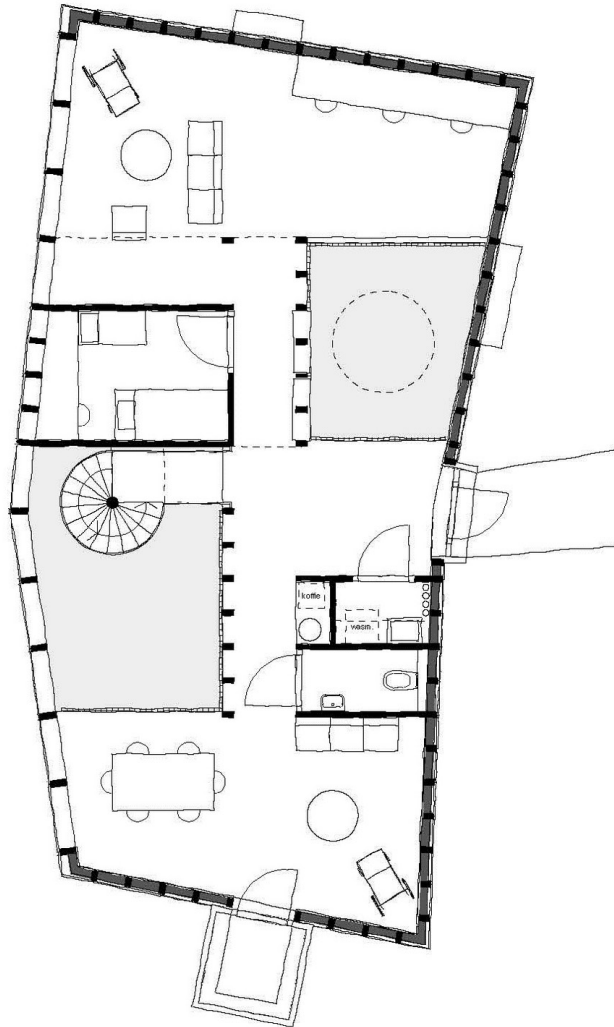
First floor [Archdaily, n.d.]
